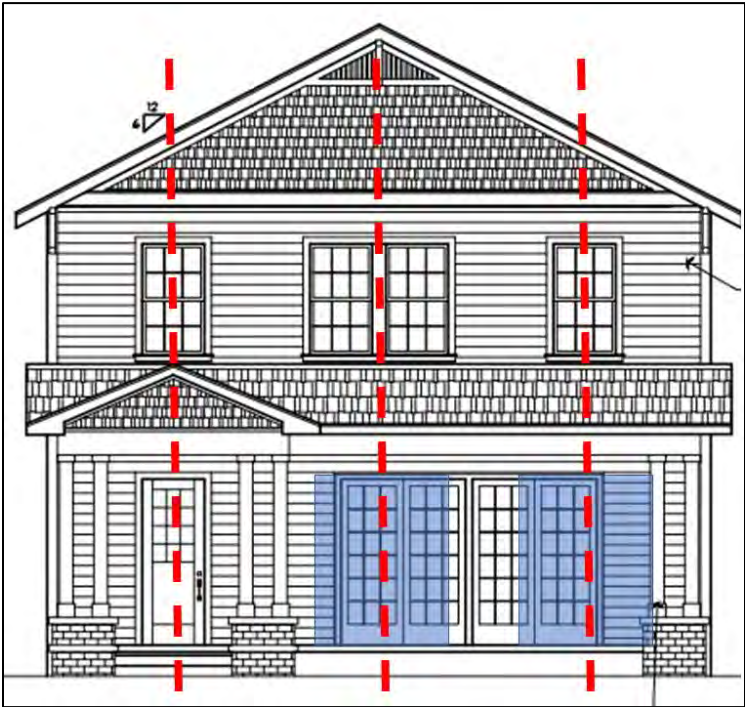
Proposed placement of French doors and centerlines of three-bay facade
